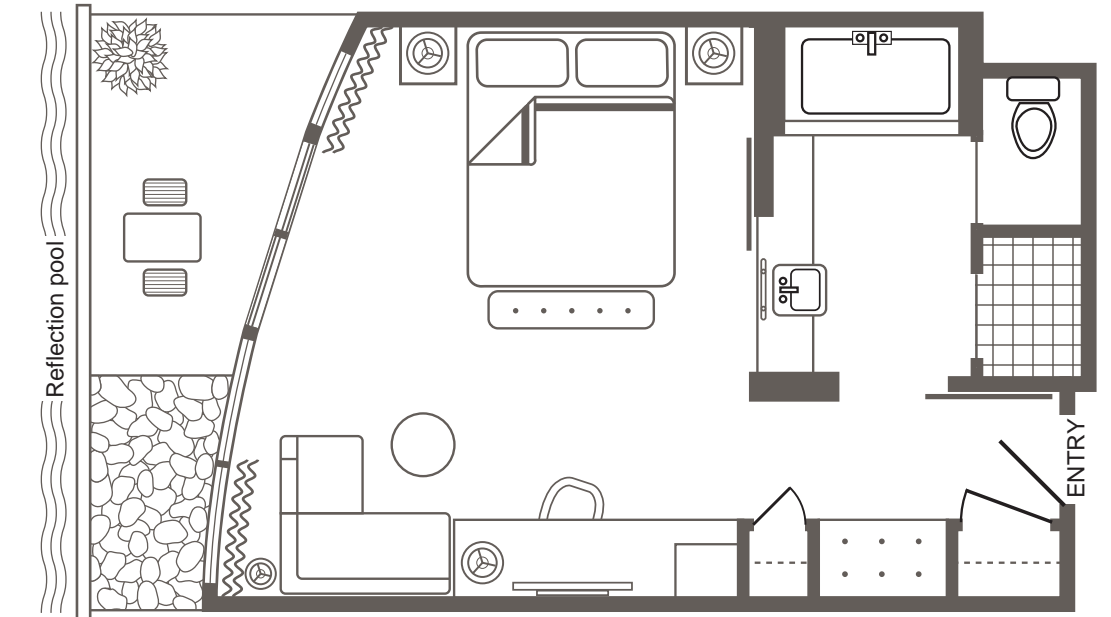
Floor plan of Garden Terrace showing external patio with reflection pool(Hewitt + Company, 2022)
